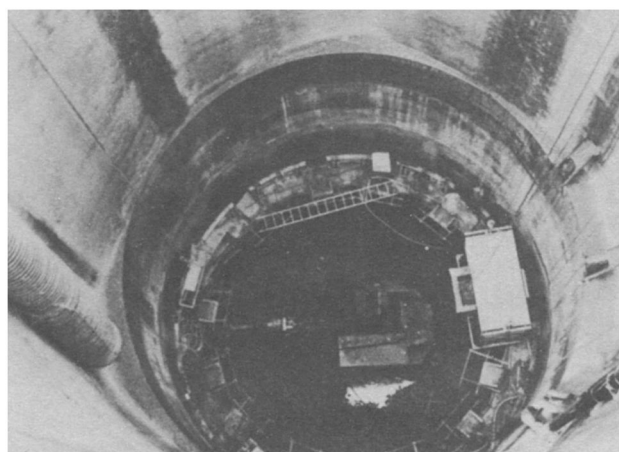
View showing backactor excavation and ring shutter installations below the diaphragm wall transition level ensure that the formation of the ice wall was obtained evenly around the shaft perimeter before the planned start of the excavation operations.
